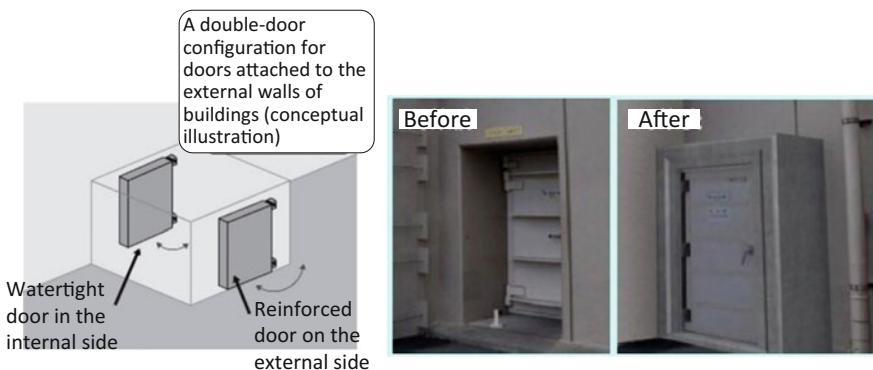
Example of watertight doors attached to the external walls of buildings [2]
